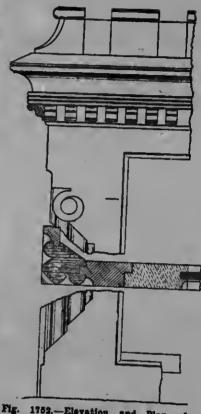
Elevation and Plan of Moulded Angle of Vestry Cupboard.
